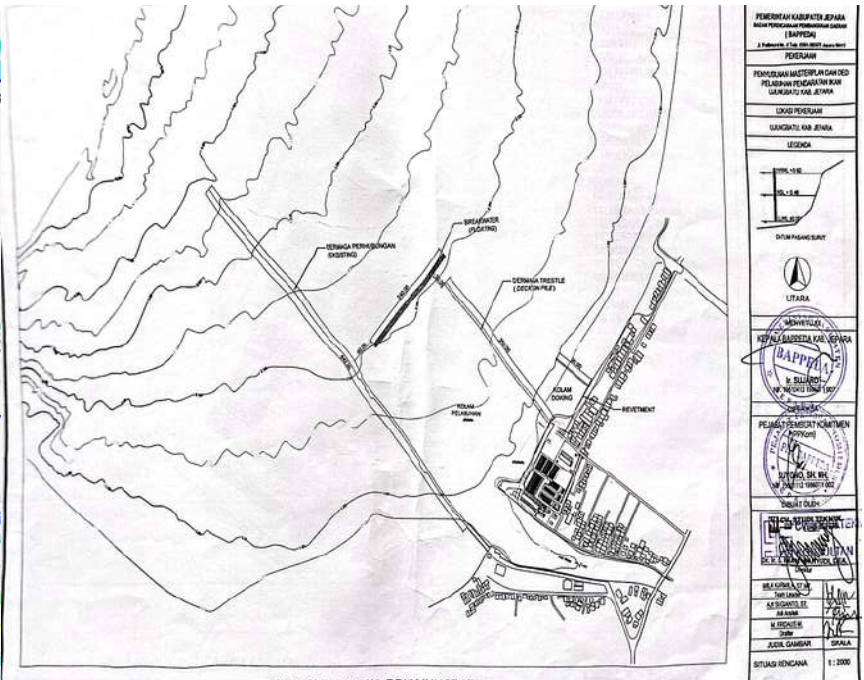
Ujung Batu Site Contour Plan Drawing
